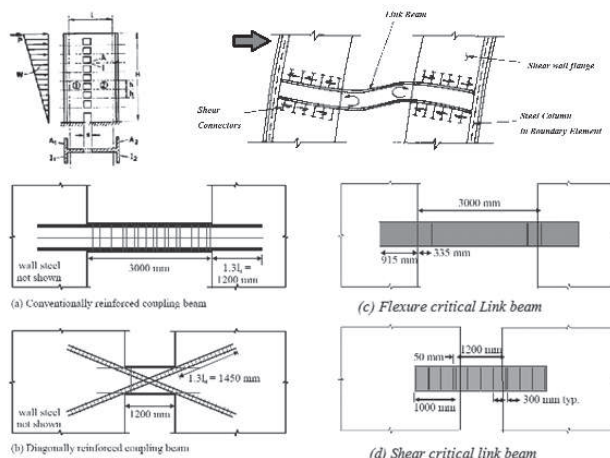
Coupled Shear Wall Subjected to Lateral Loading with different options for Link beams
